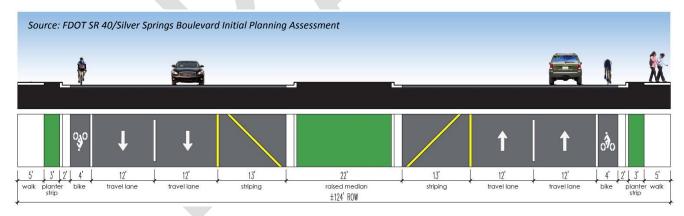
Existing Typical Cross-Section on SR 35 south of SR 40
